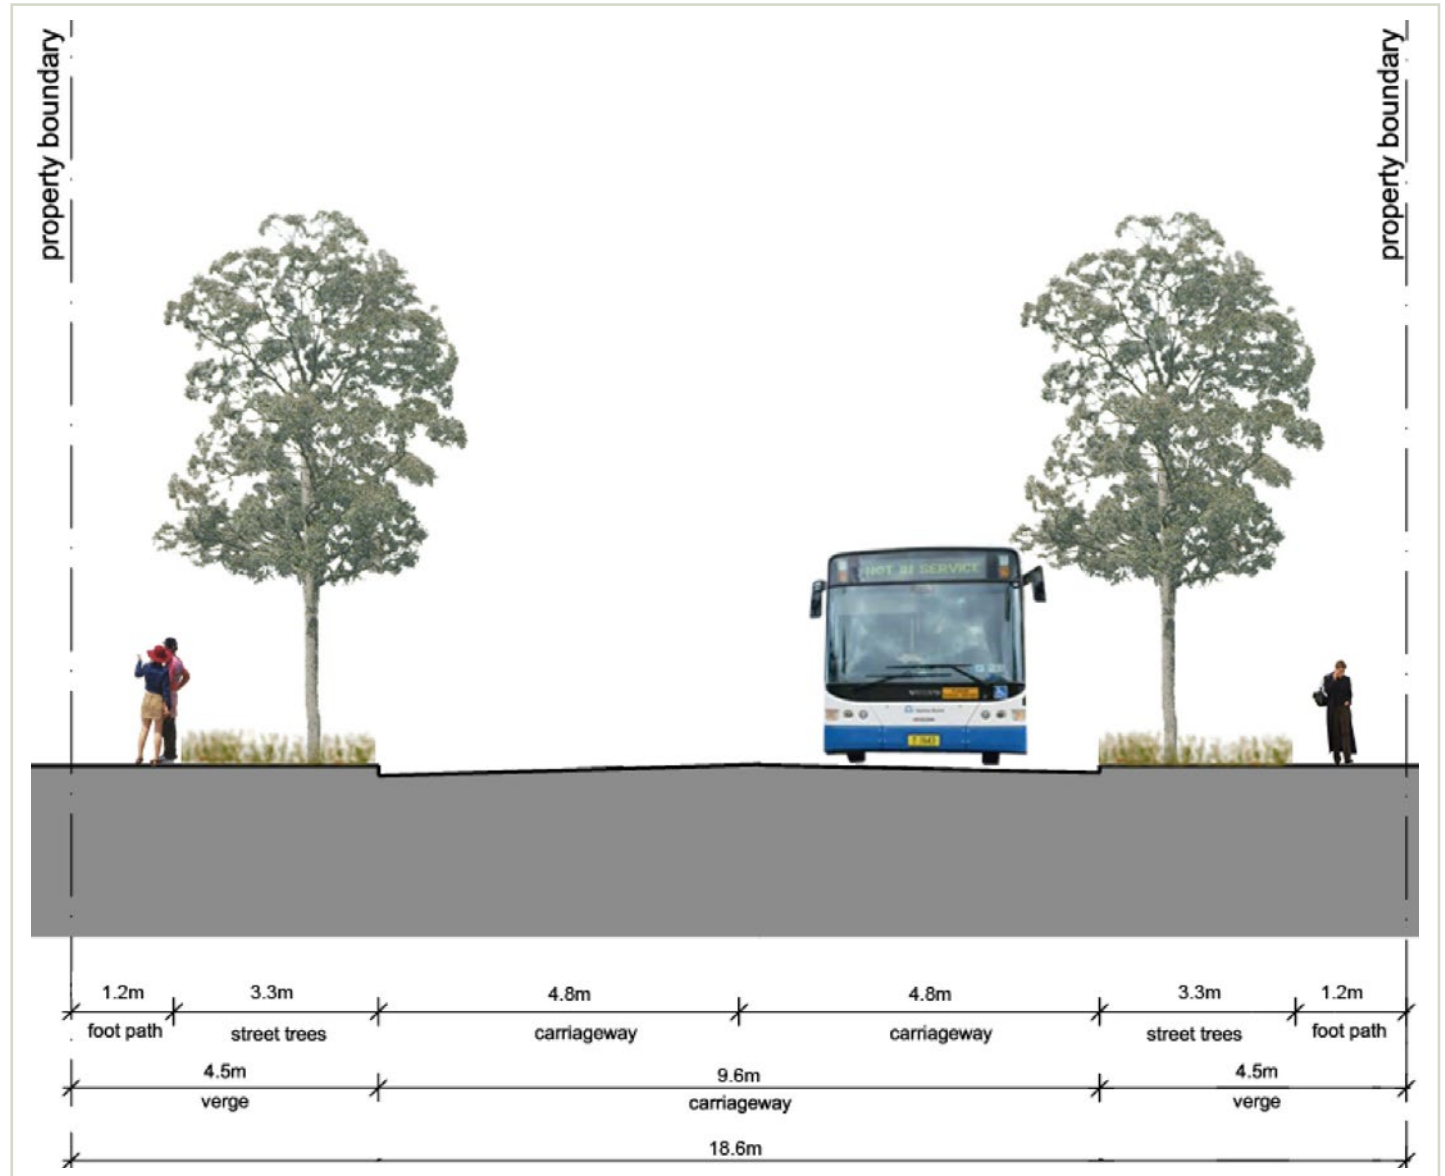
Local Road with Bus Route 18.6m (Section 5-5)
